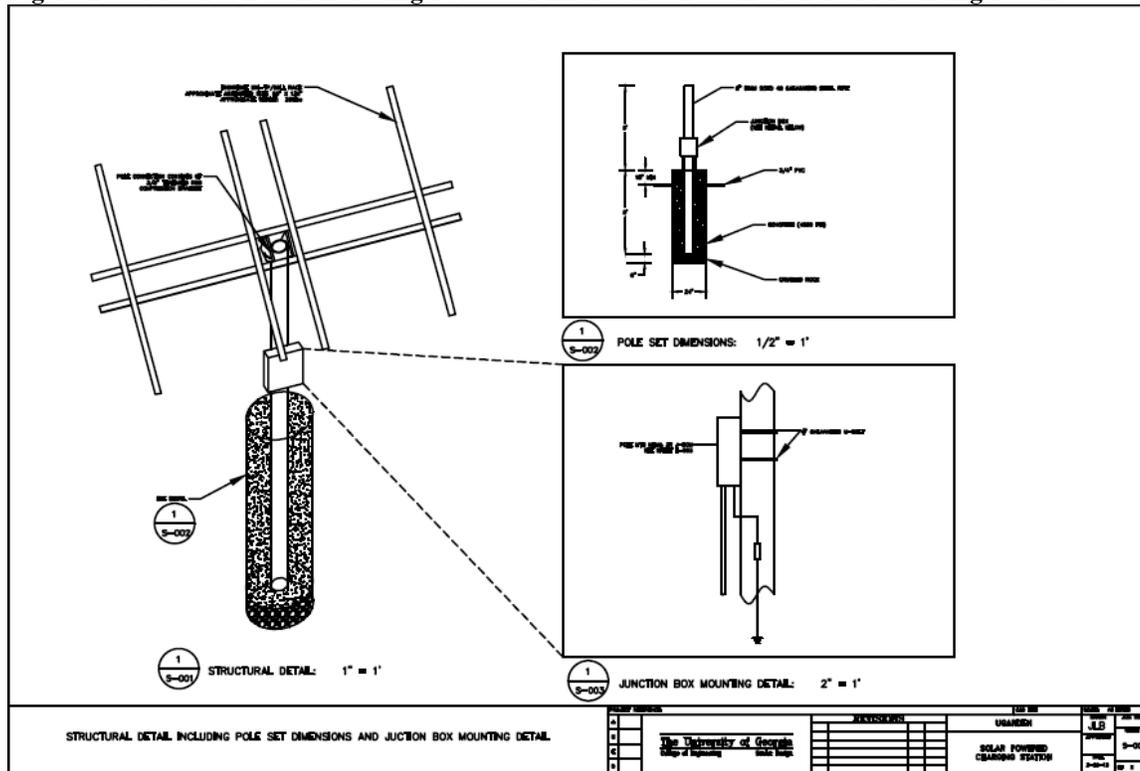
Pole Installation Dimensions and Direct Burial Detail
